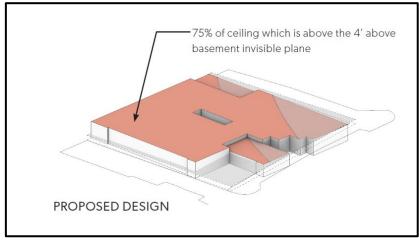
Proposed Parking Garage Ceiling Plane (Project Plans Page 46)
